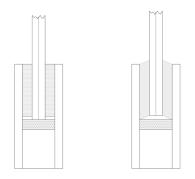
Left: Sketch of the connection detail for the glass panes at the lower and upper edge. The glass panes are glued into a steel clamp - which is fixed to the edges of the roof and the box girder – with structural glazing material. Right: The glass can execute relative movements to the steel parts, at the same time it is partly clamped.
